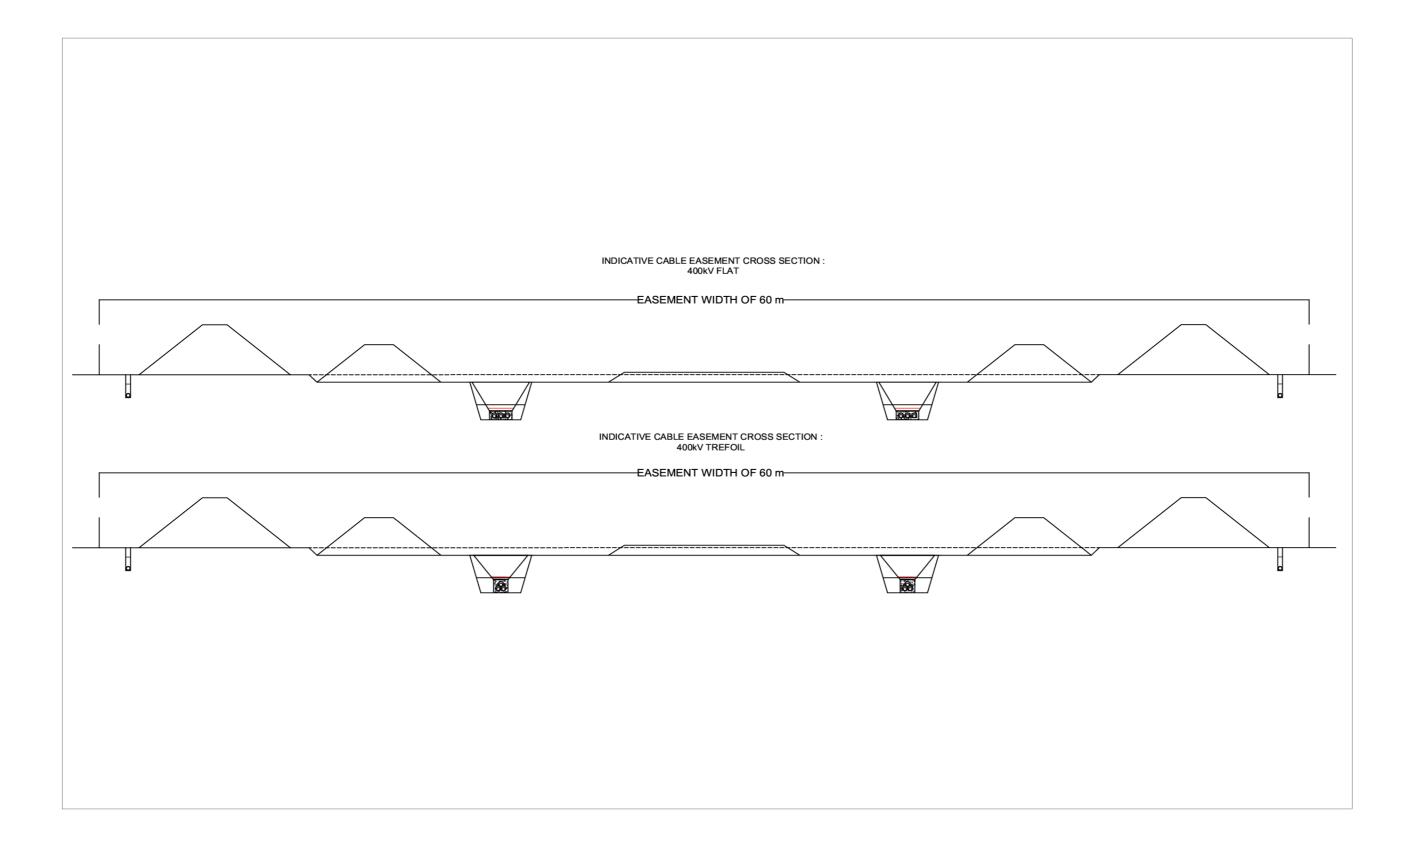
Indicative cross section of the 400kV grid connection export cable trench.
